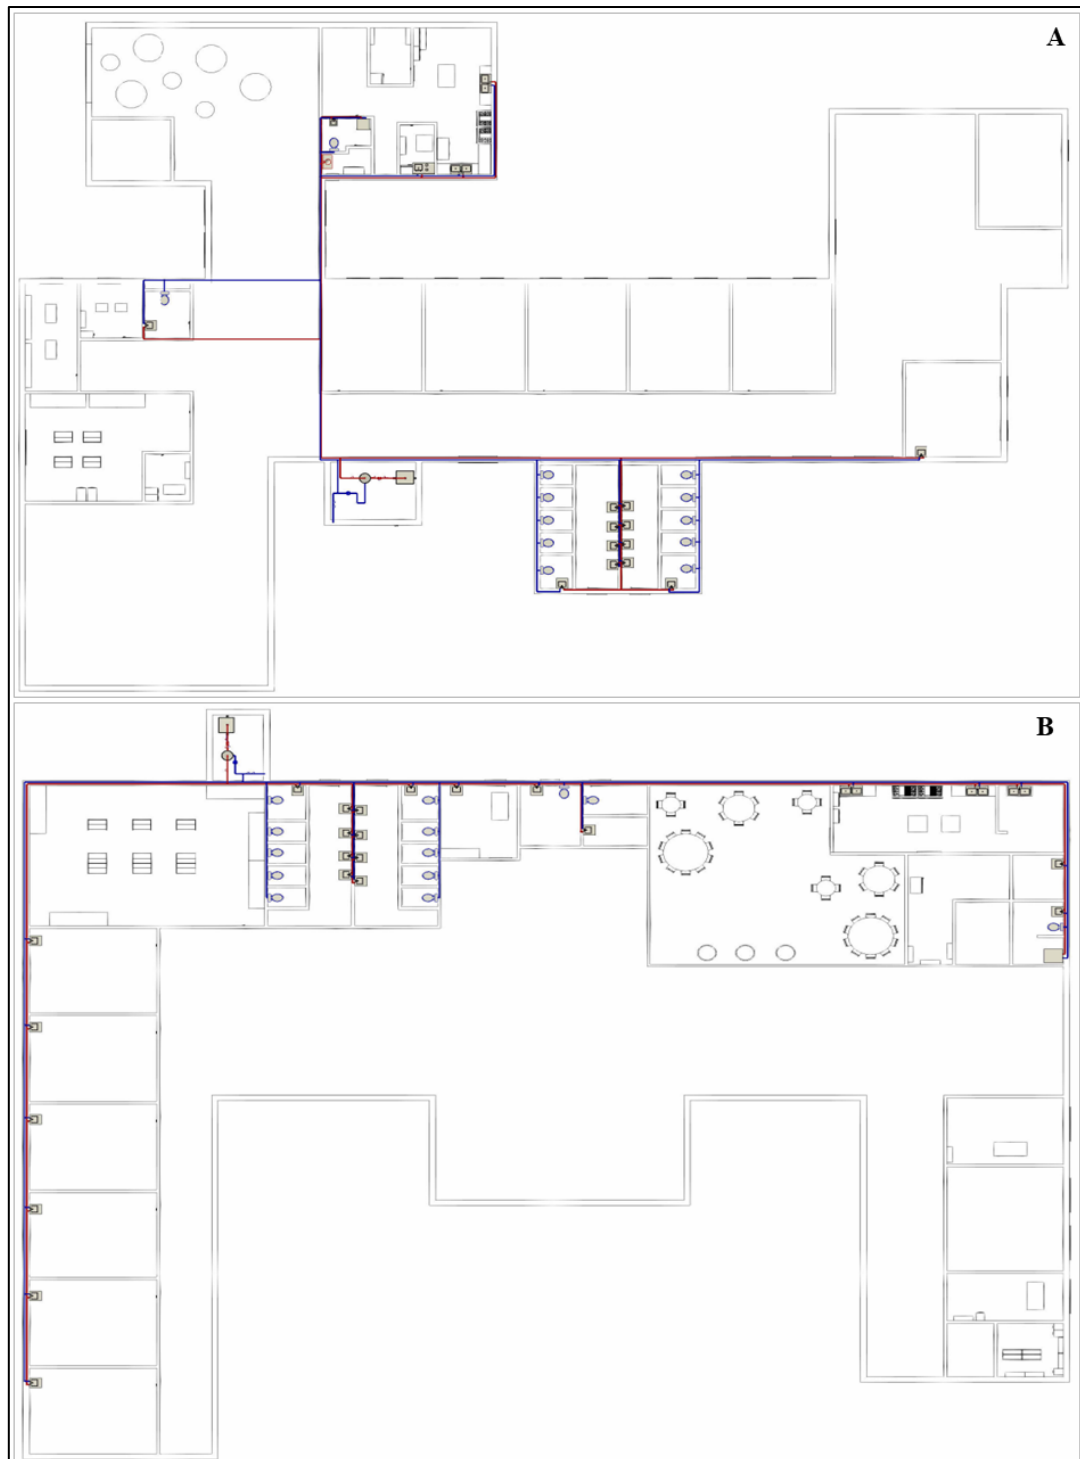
Schematic layout of the two fictitious building plumbing: A) Building 1 and B) Building 2.
